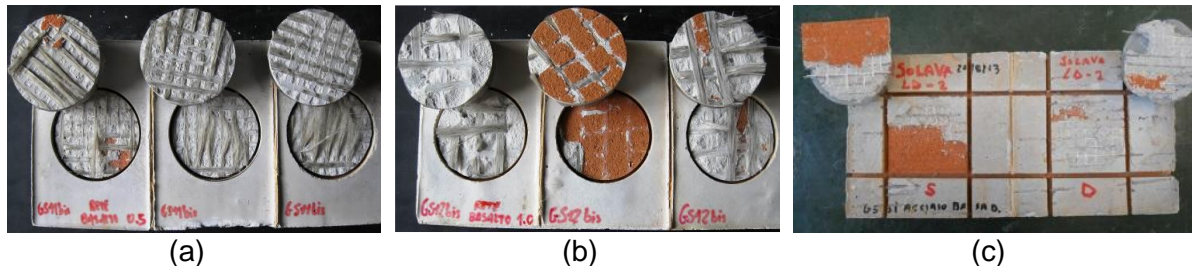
Pull off test failures obtained for: (a) masonry reinforcement with basalt net 1; (b) basalt net 2 and (c) with steel fabrics (Garbin, et al., 2014)
